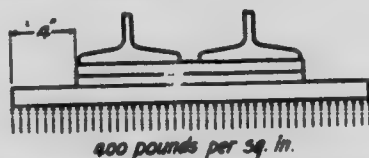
CANTILEVER BEAM ACTION OF BEARING PLATE
